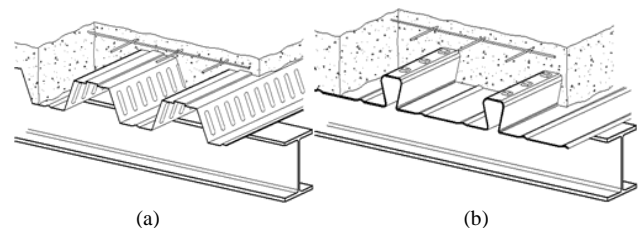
Composite Slabs Types (a) Re-entrant, (b) Trapezoidal
